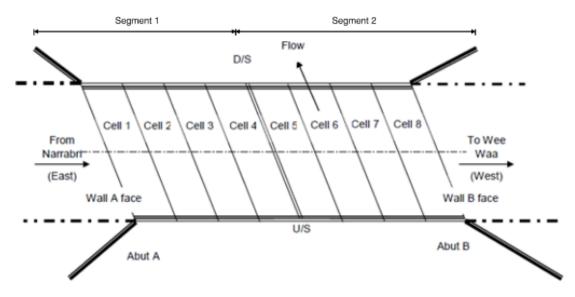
Structure plan nomenclature (Source: TfNSW and FBE)
